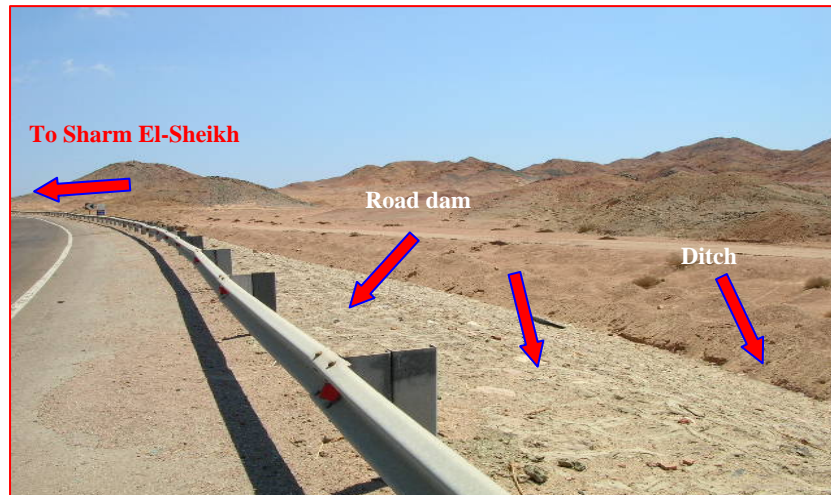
Ditches and road dam of Suez- Sharm El-Sheikh Highway
